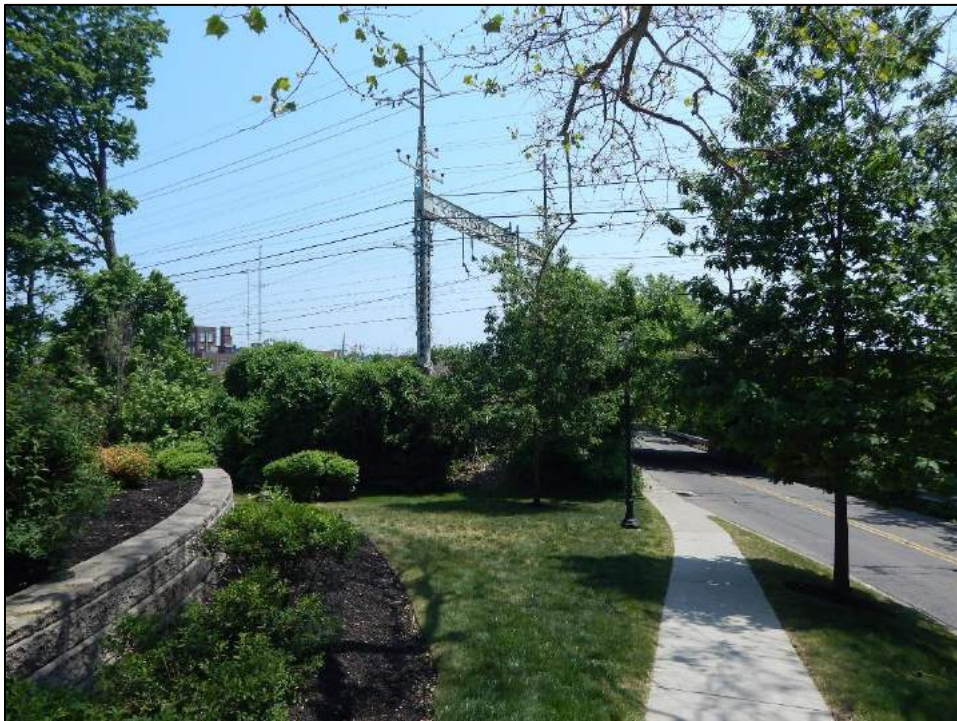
Overview photo of proposed work/pulling pad location looking southeast from Prospect Street in Milford toward existing CT DOT corridor.
